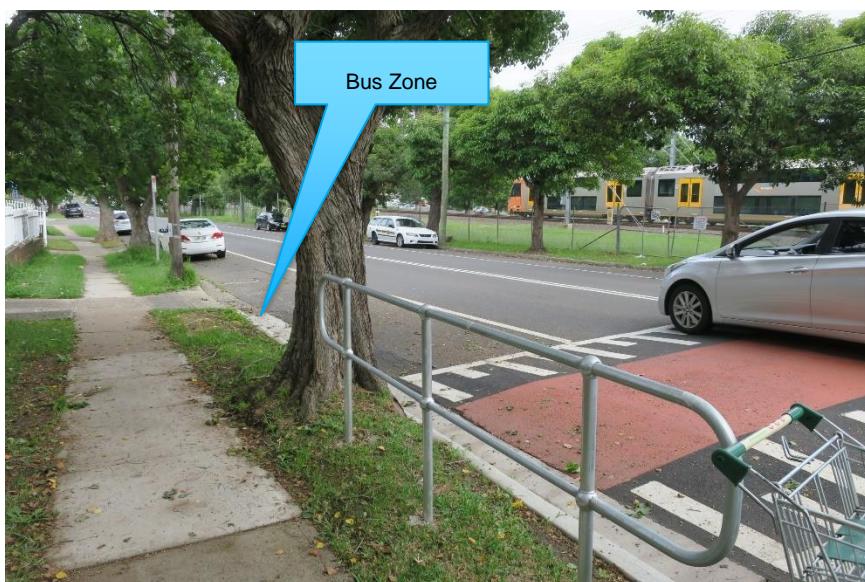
Bus zone at *The Boulevard* westbound just after the slow ramp (refer to Appendix A for details)
